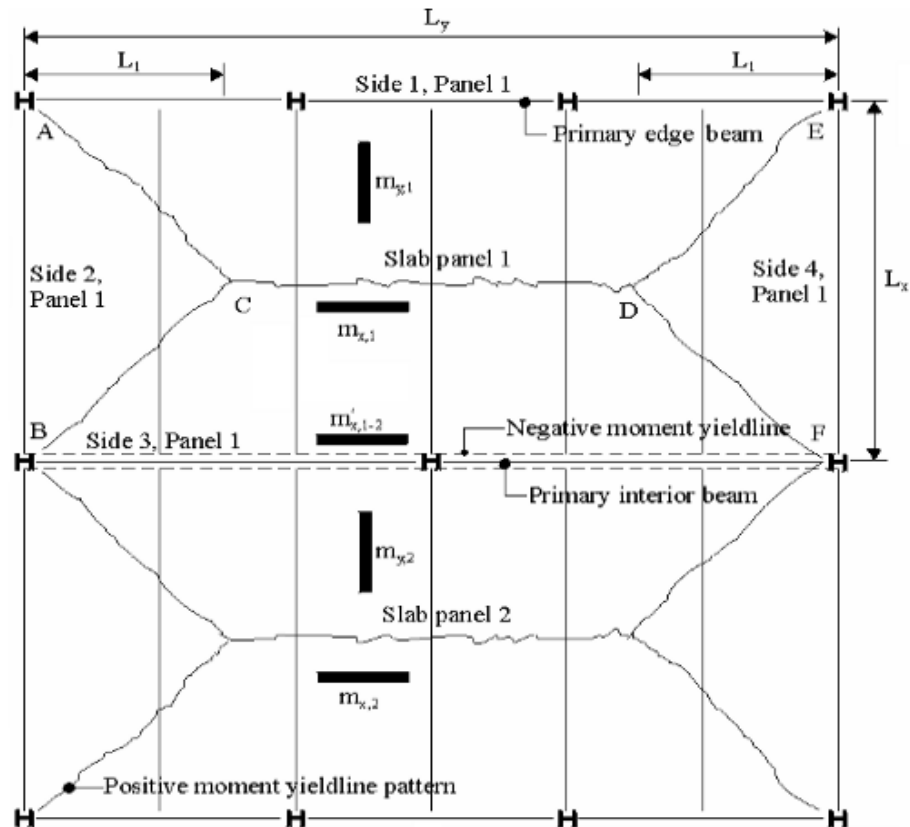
Floor plan showing dimensions for yield line pattern and developed moments
